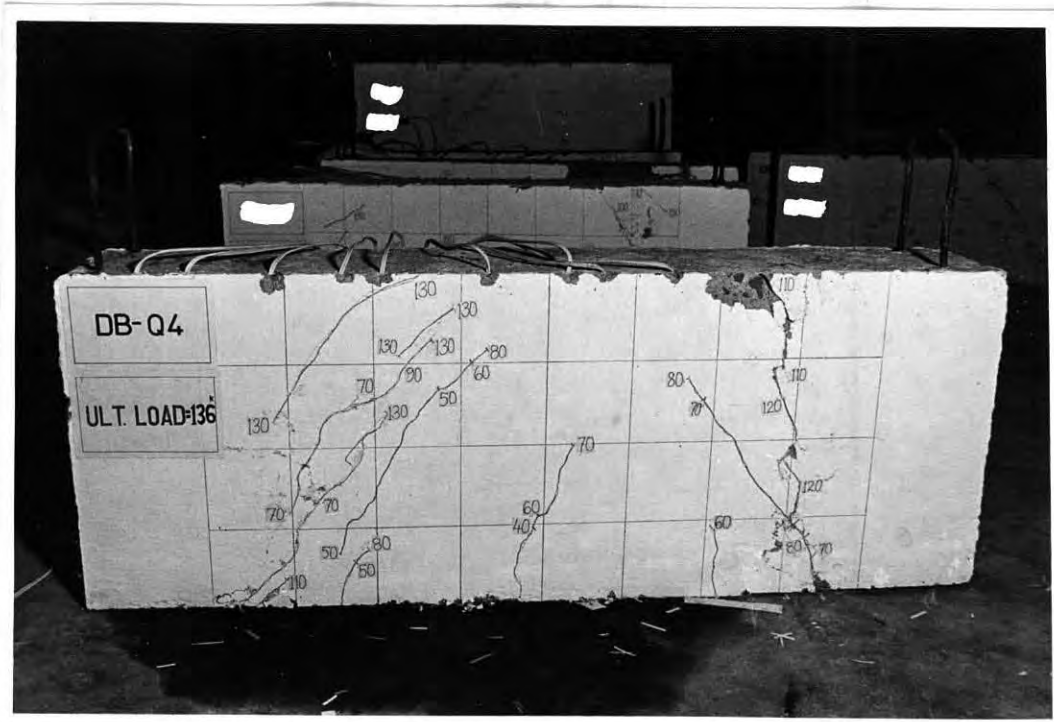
Mode of Failure and Crack Pattern of Beam DB-Q4
